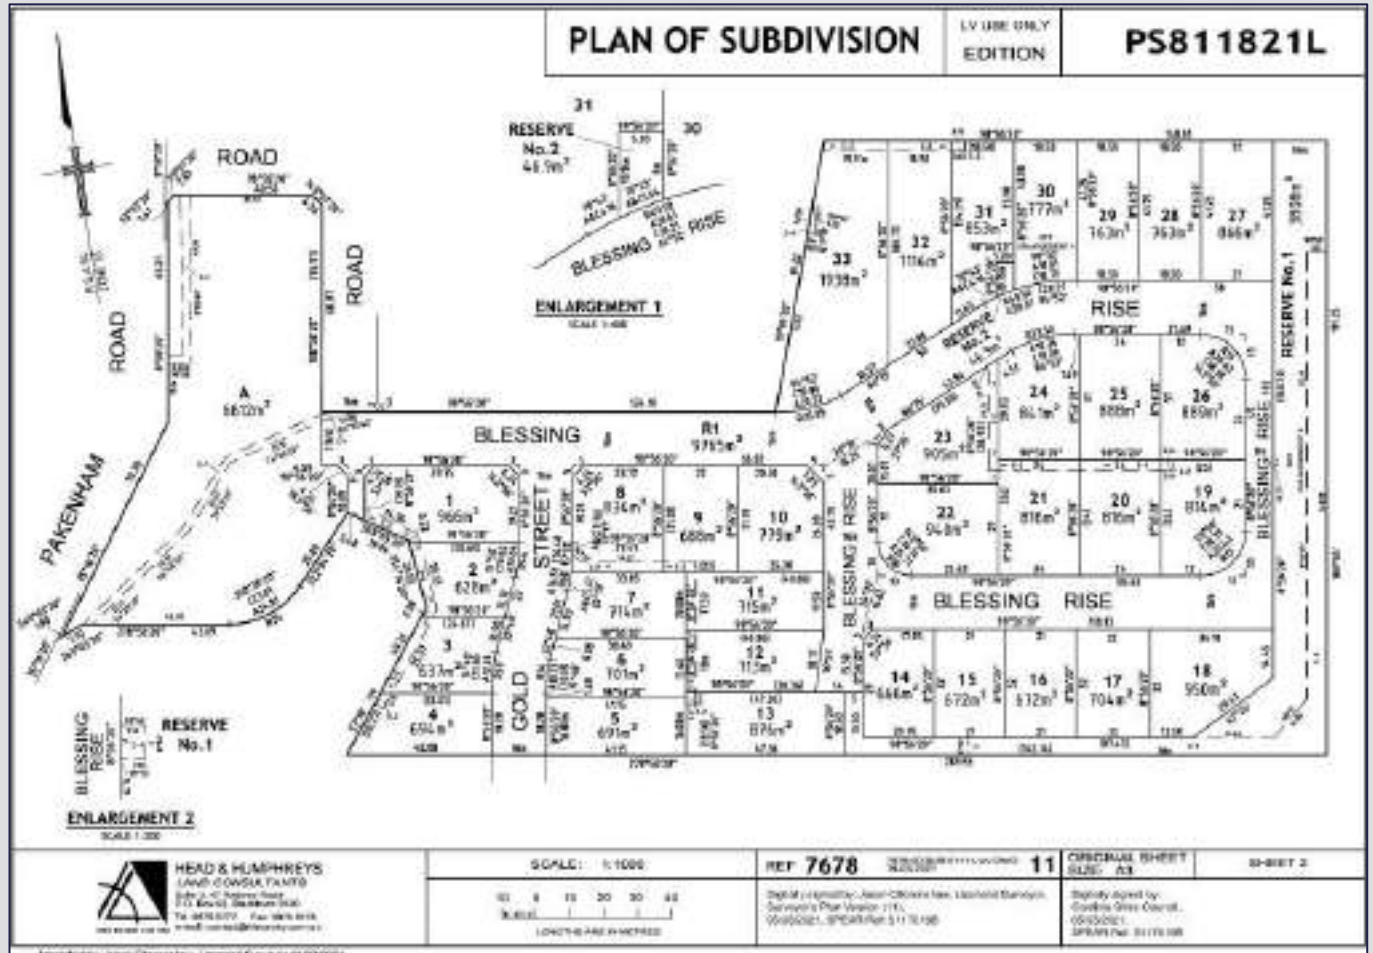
Lot A PS 811821L (Existing Plan of Subdivision)
